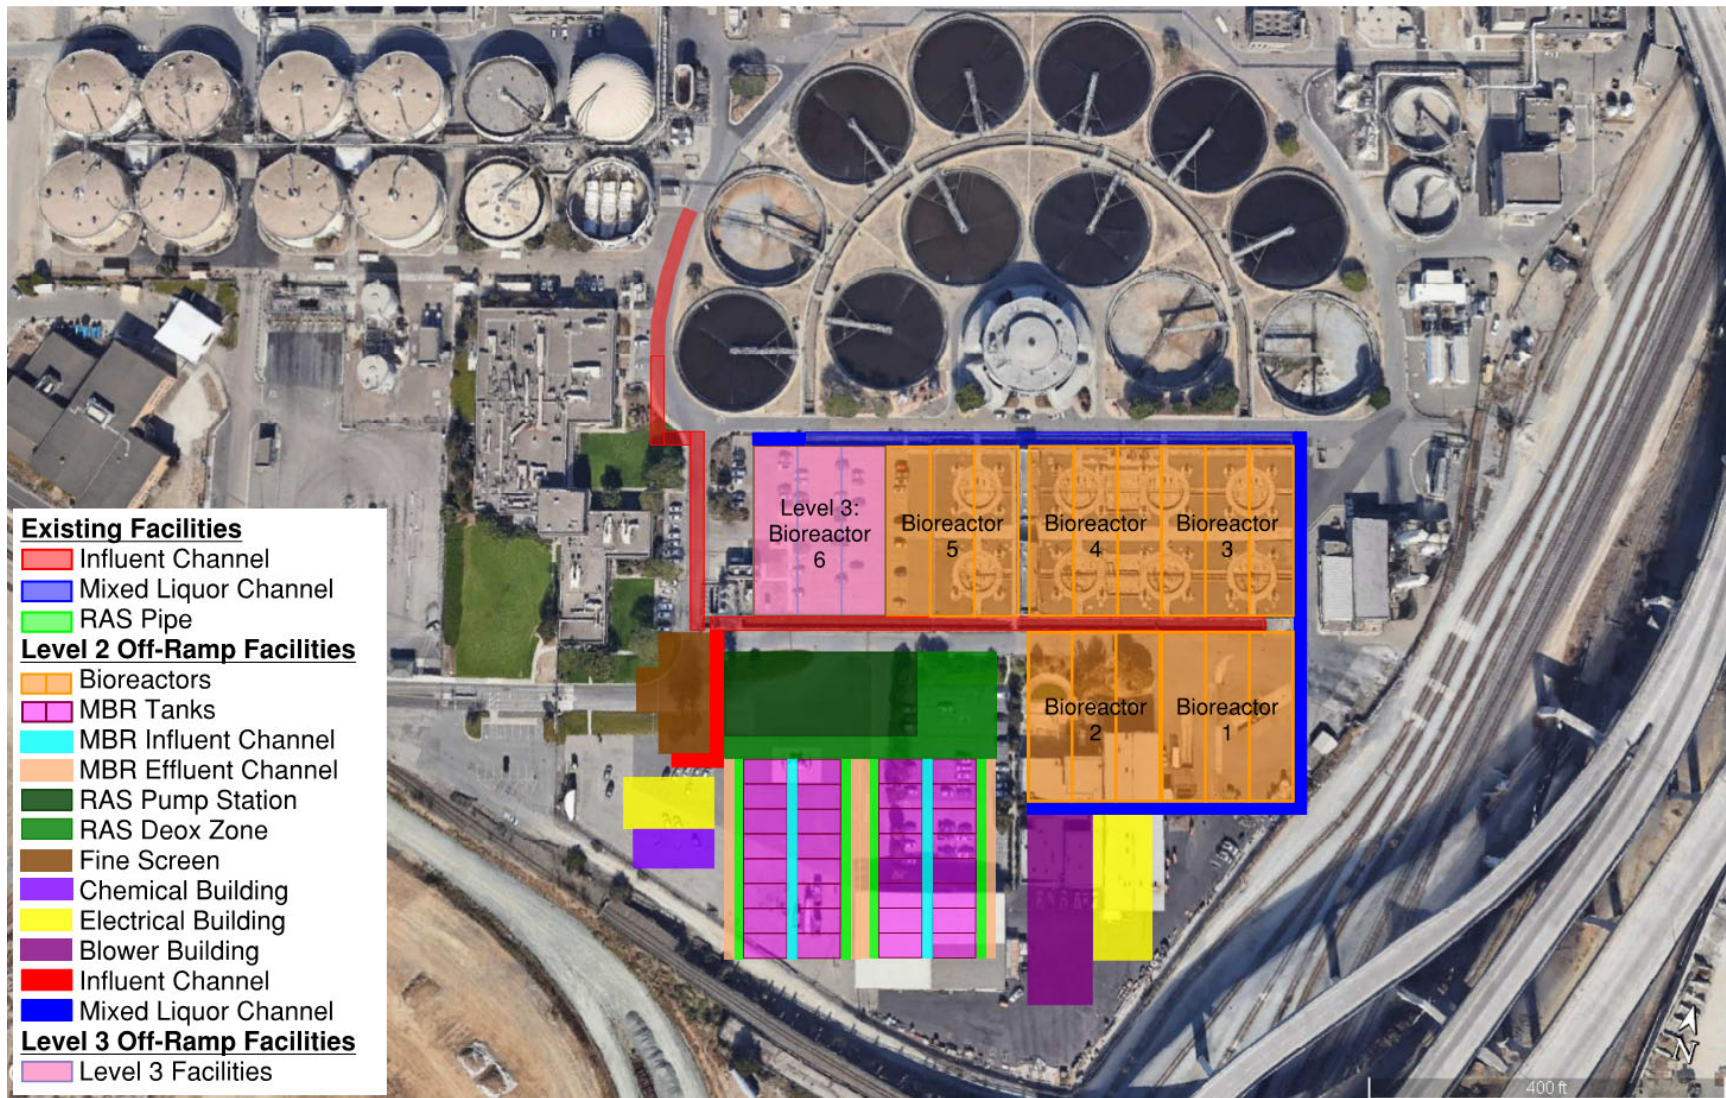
Alternative 3 MBR – Conceptual Site Layout
